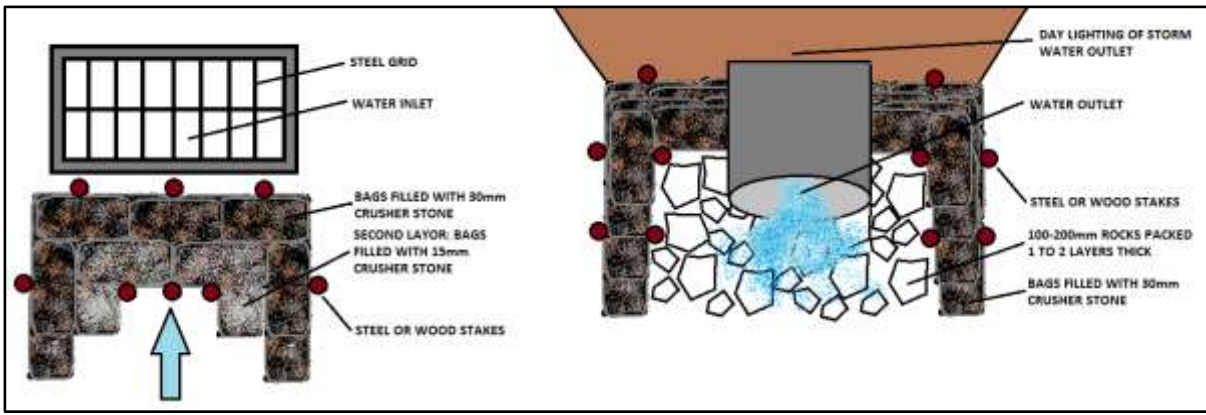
Temporary culvert inlet and outlet (Solek, 2014)
